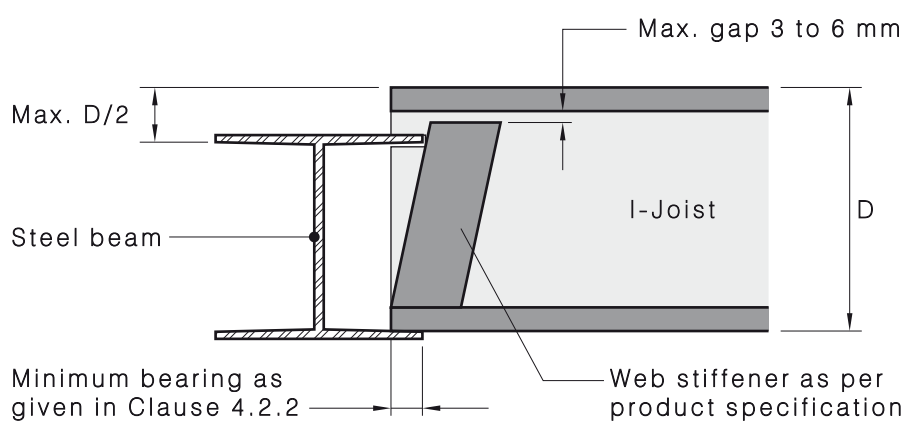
CONNECTION OF I-JOISTS TO A STEEL BEAM—METHOD 2
